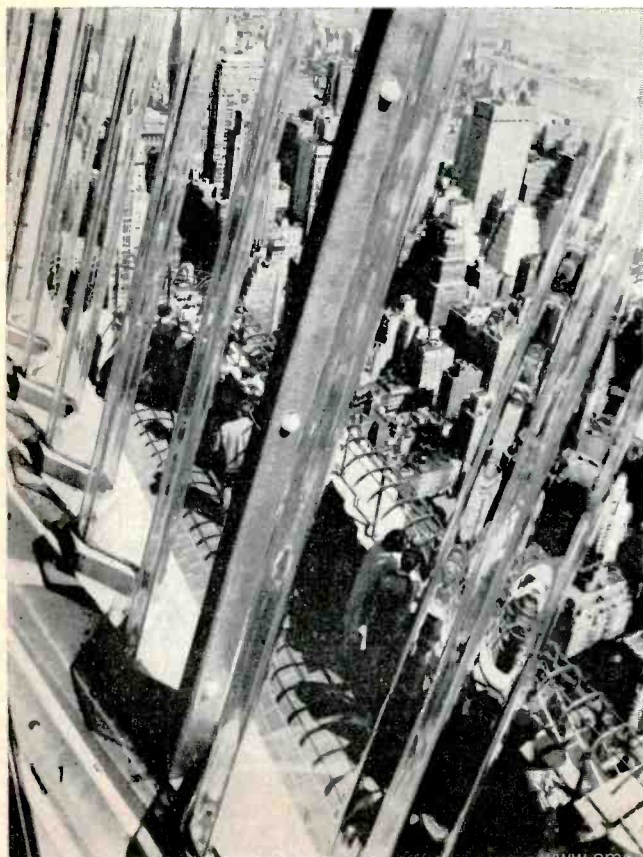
Skyward shot taken from the observation deck of the Empire State Building shows the final installation work on one corner of the east side enclosure.
